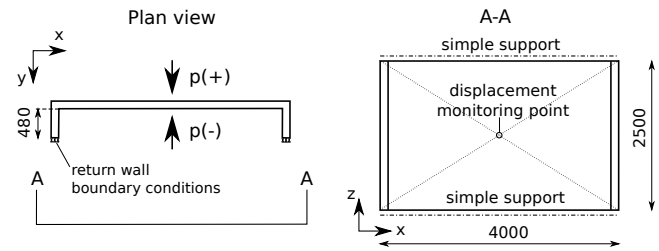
Two-way bending: geometry and boundary conditions of structure (dimensions in mm)
